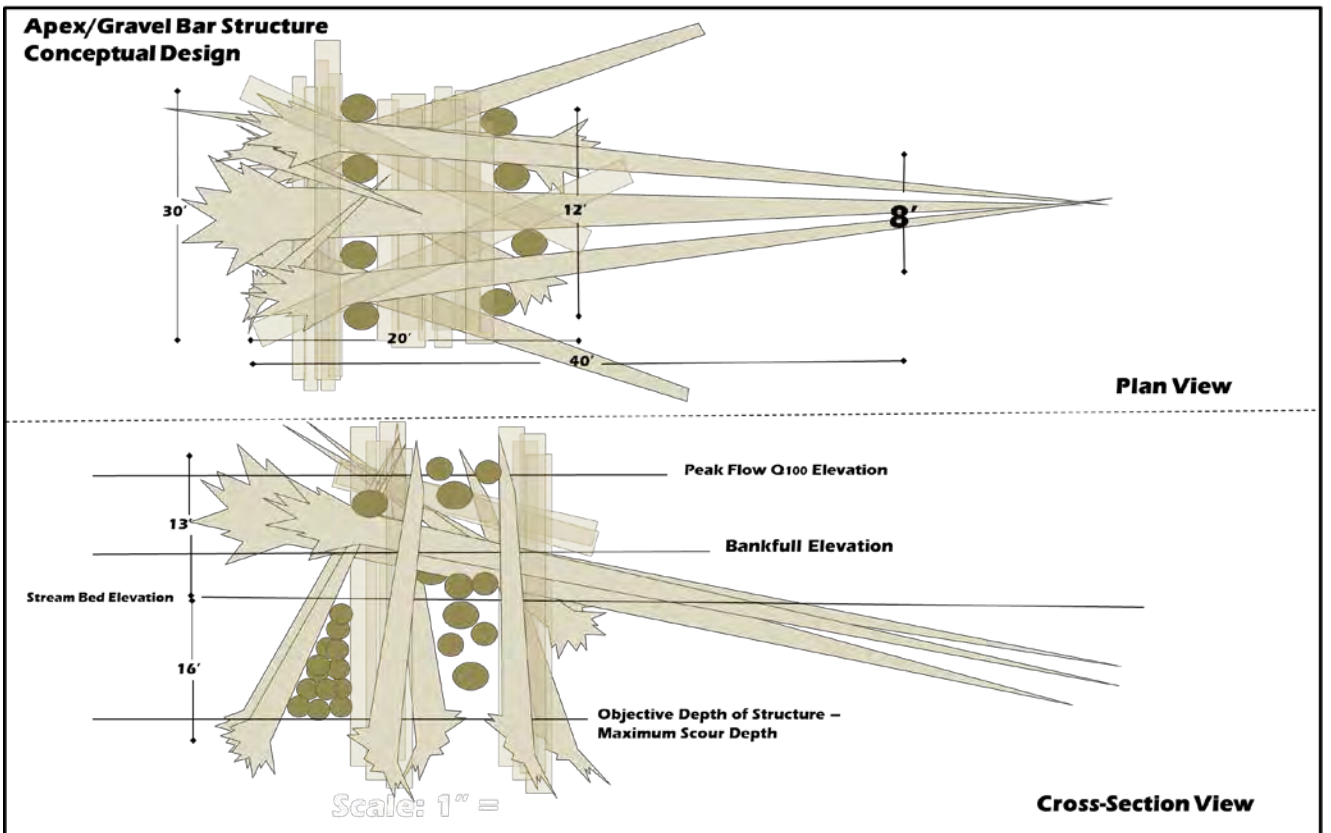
Conceptual apex/gravel bar structure showing proposed structure heights, widths, and scour depths.
